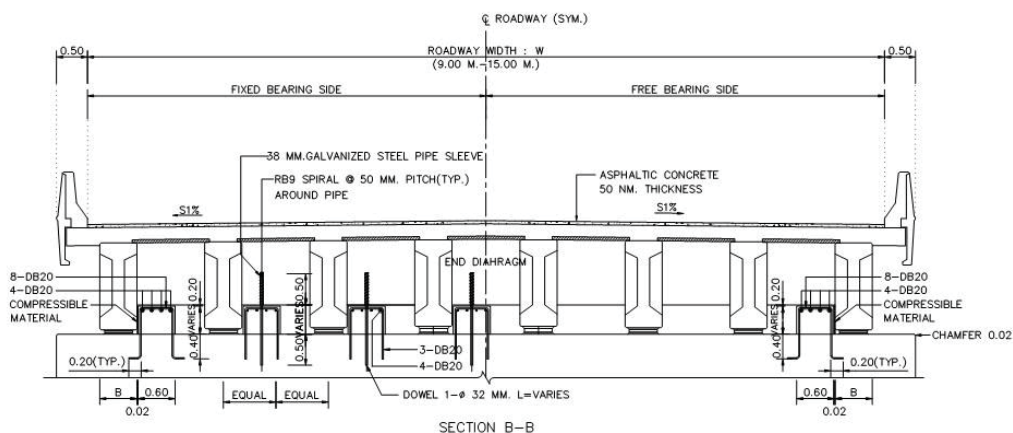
ELASTOMERIC BEARING PAD AND BUFFER
